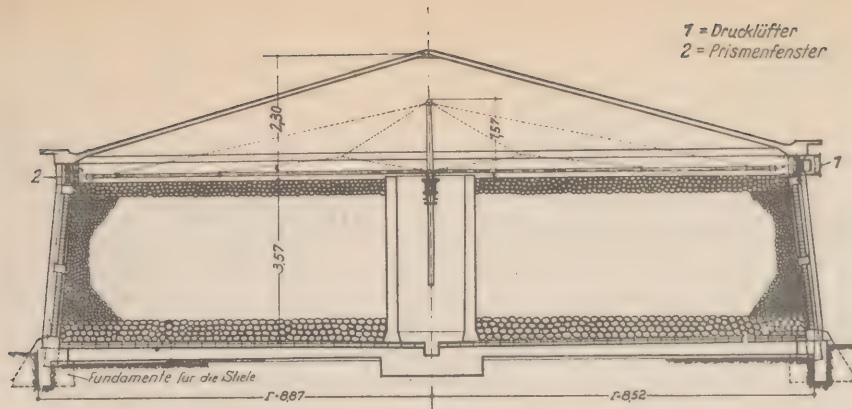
e, Soest Sewage Plant Design Trickling Filter
